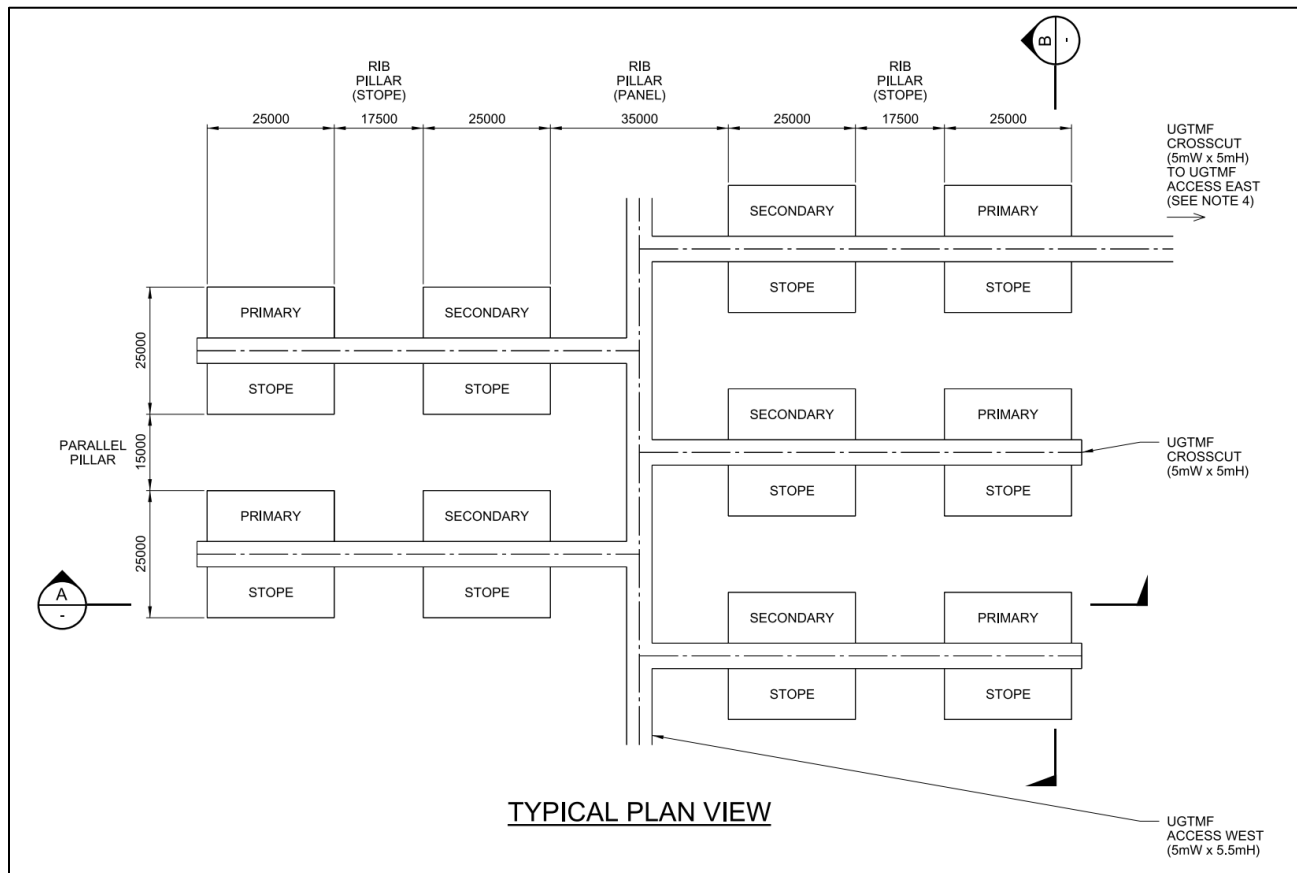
Underground Tailings Management Facility Typical Plan View
